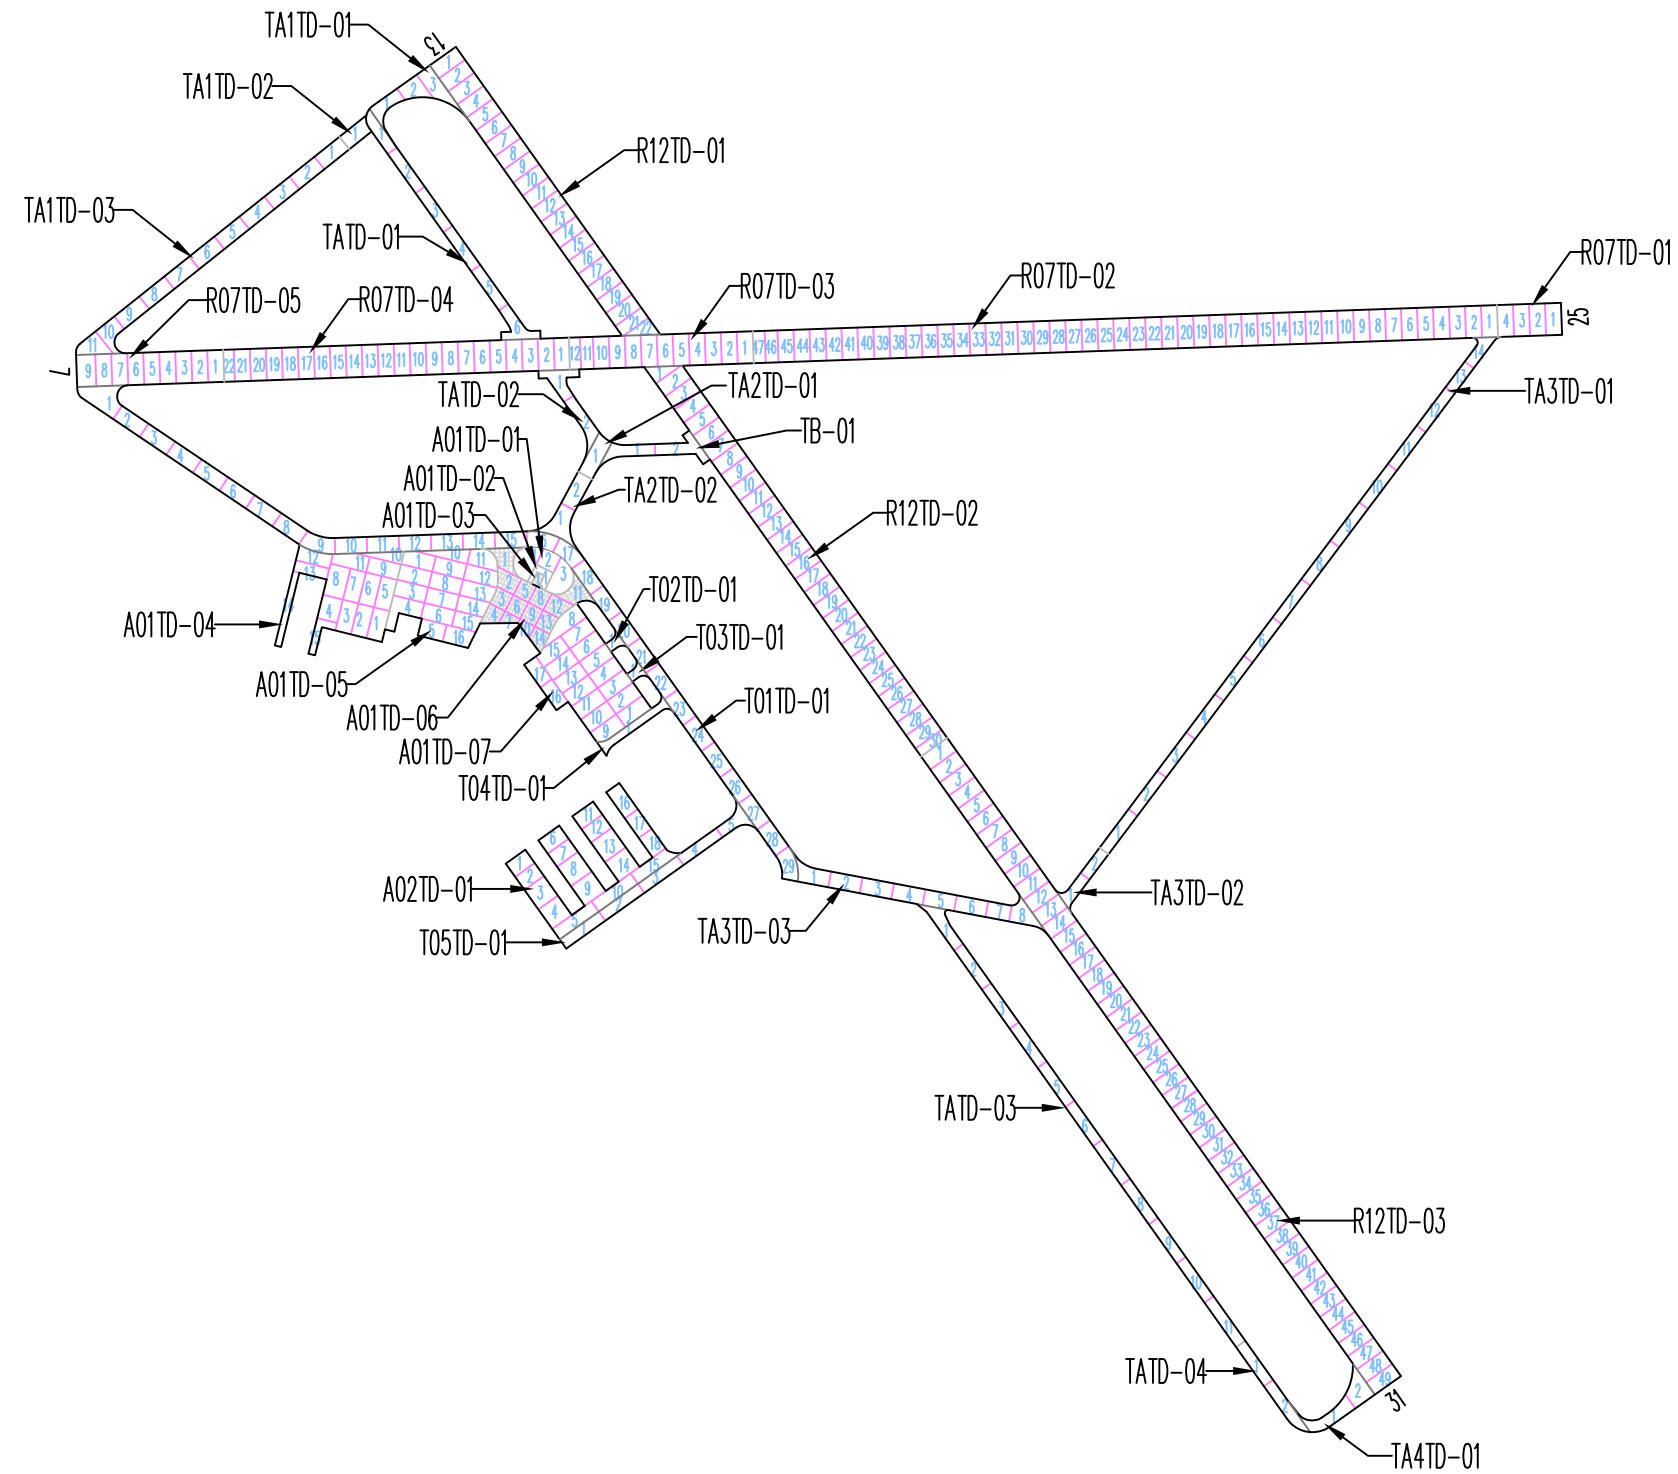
Pavement Branch, Section and Sample Unit Layout.
